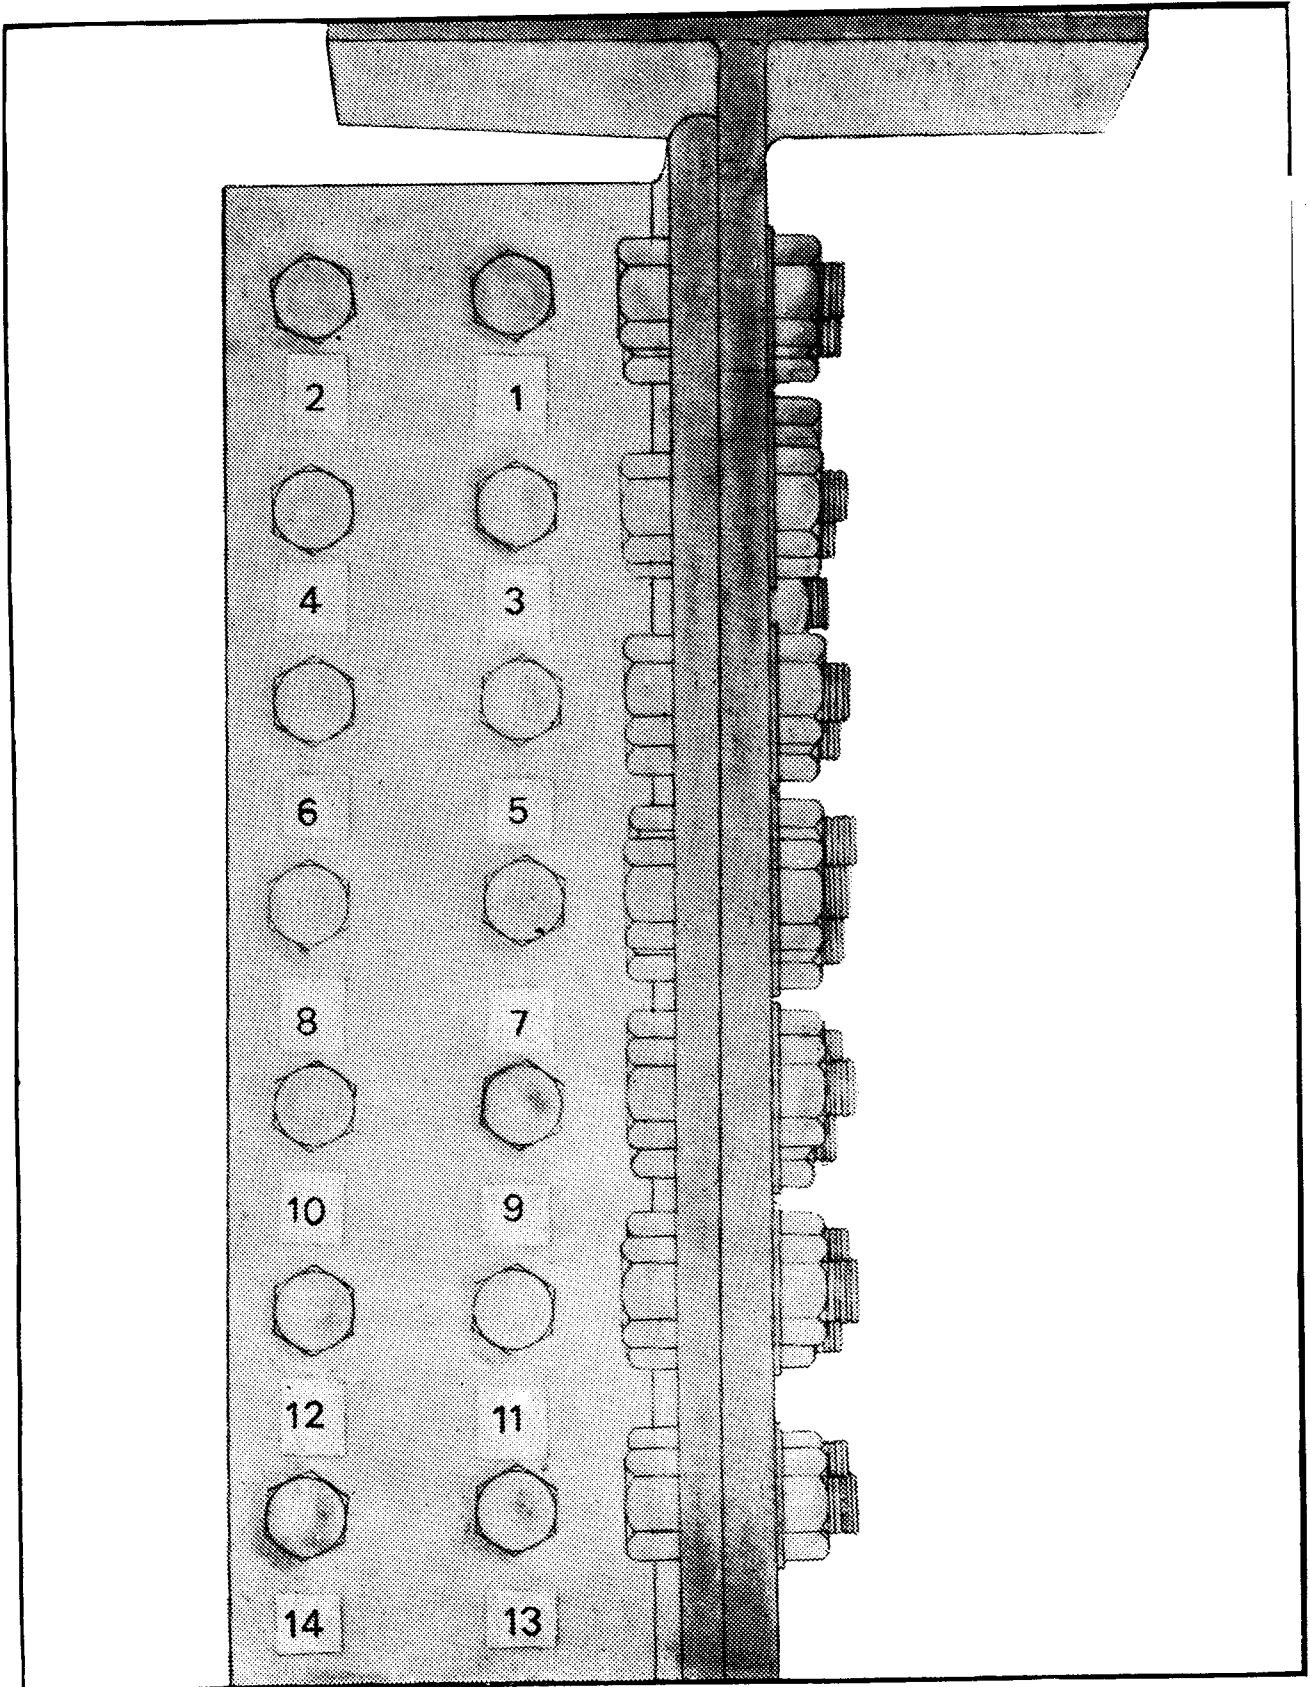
SUGGESTED TIGHTENING SEQUENCE
